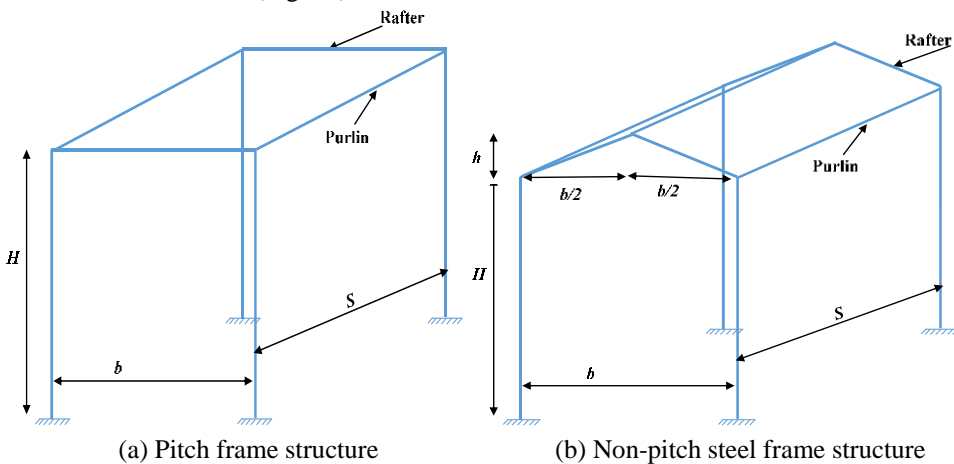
Typical sections of pitch and non-pitch fixed feet open frame
